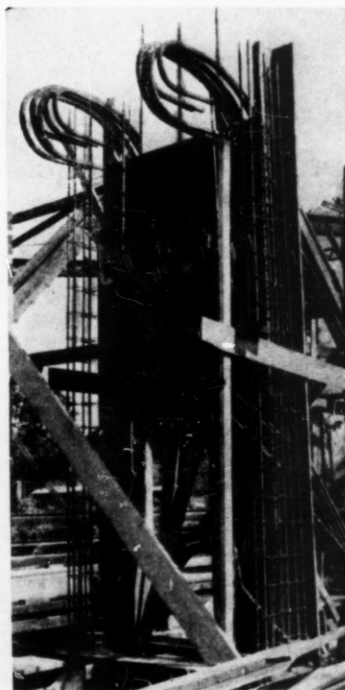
DETAIL of first vertical, showing reinforcement and interior forms.
